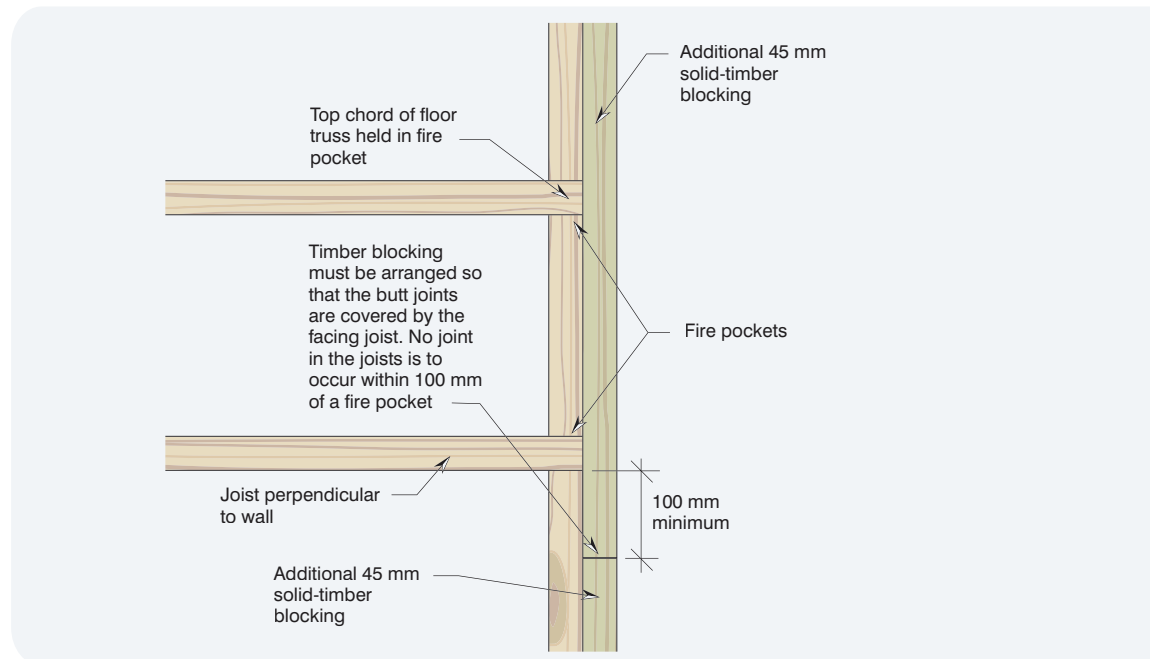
Floor-truss top chord supported in pocket – FRL 60 minutes – plan view.
